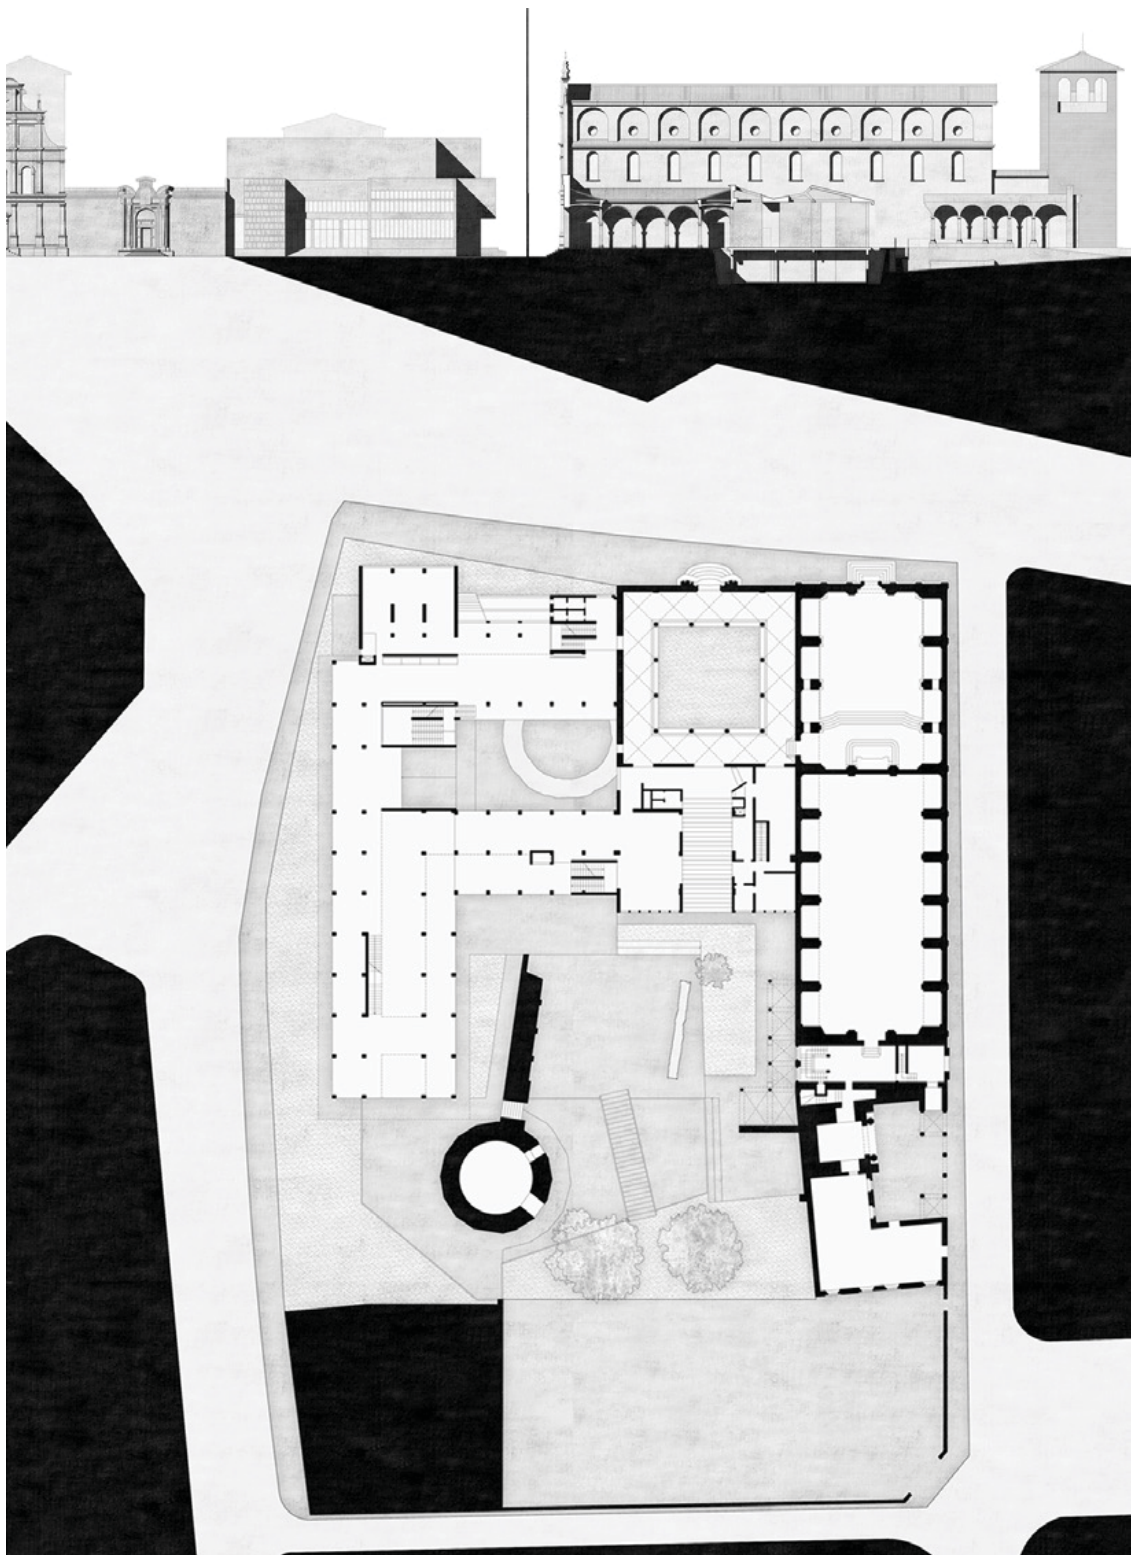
First project hypothesis (1954): new project as a fragment of the history. Ground floor plan, cross section and elevation on corso Magenta. Drawing by the author.
